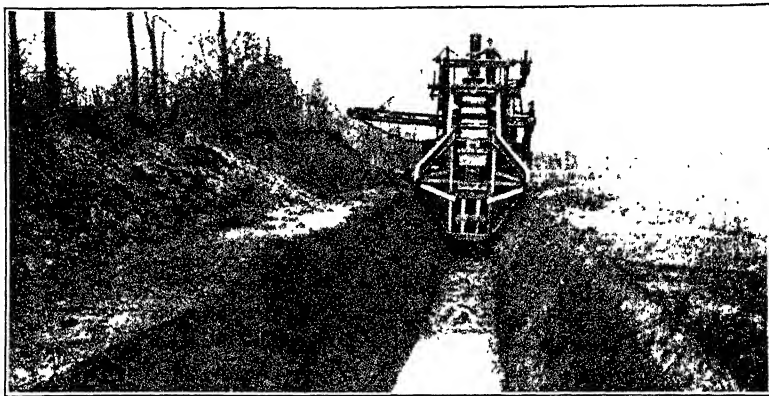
Wheel Excavator Constructing Small Drainage Ditch
